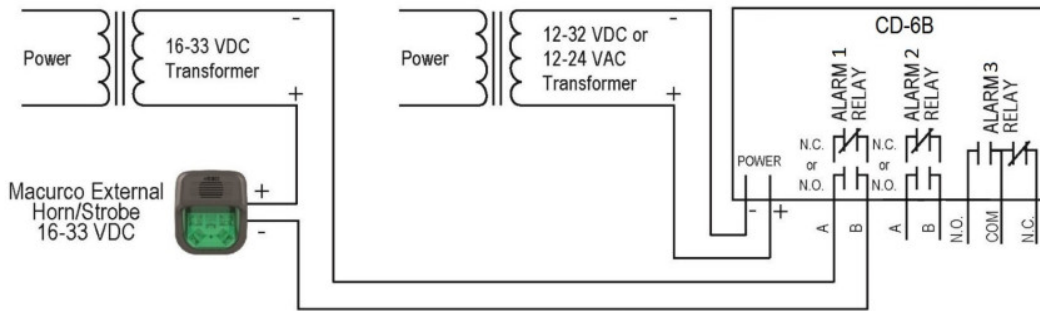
CD-6B Horn & Strobe Combo Wiring
